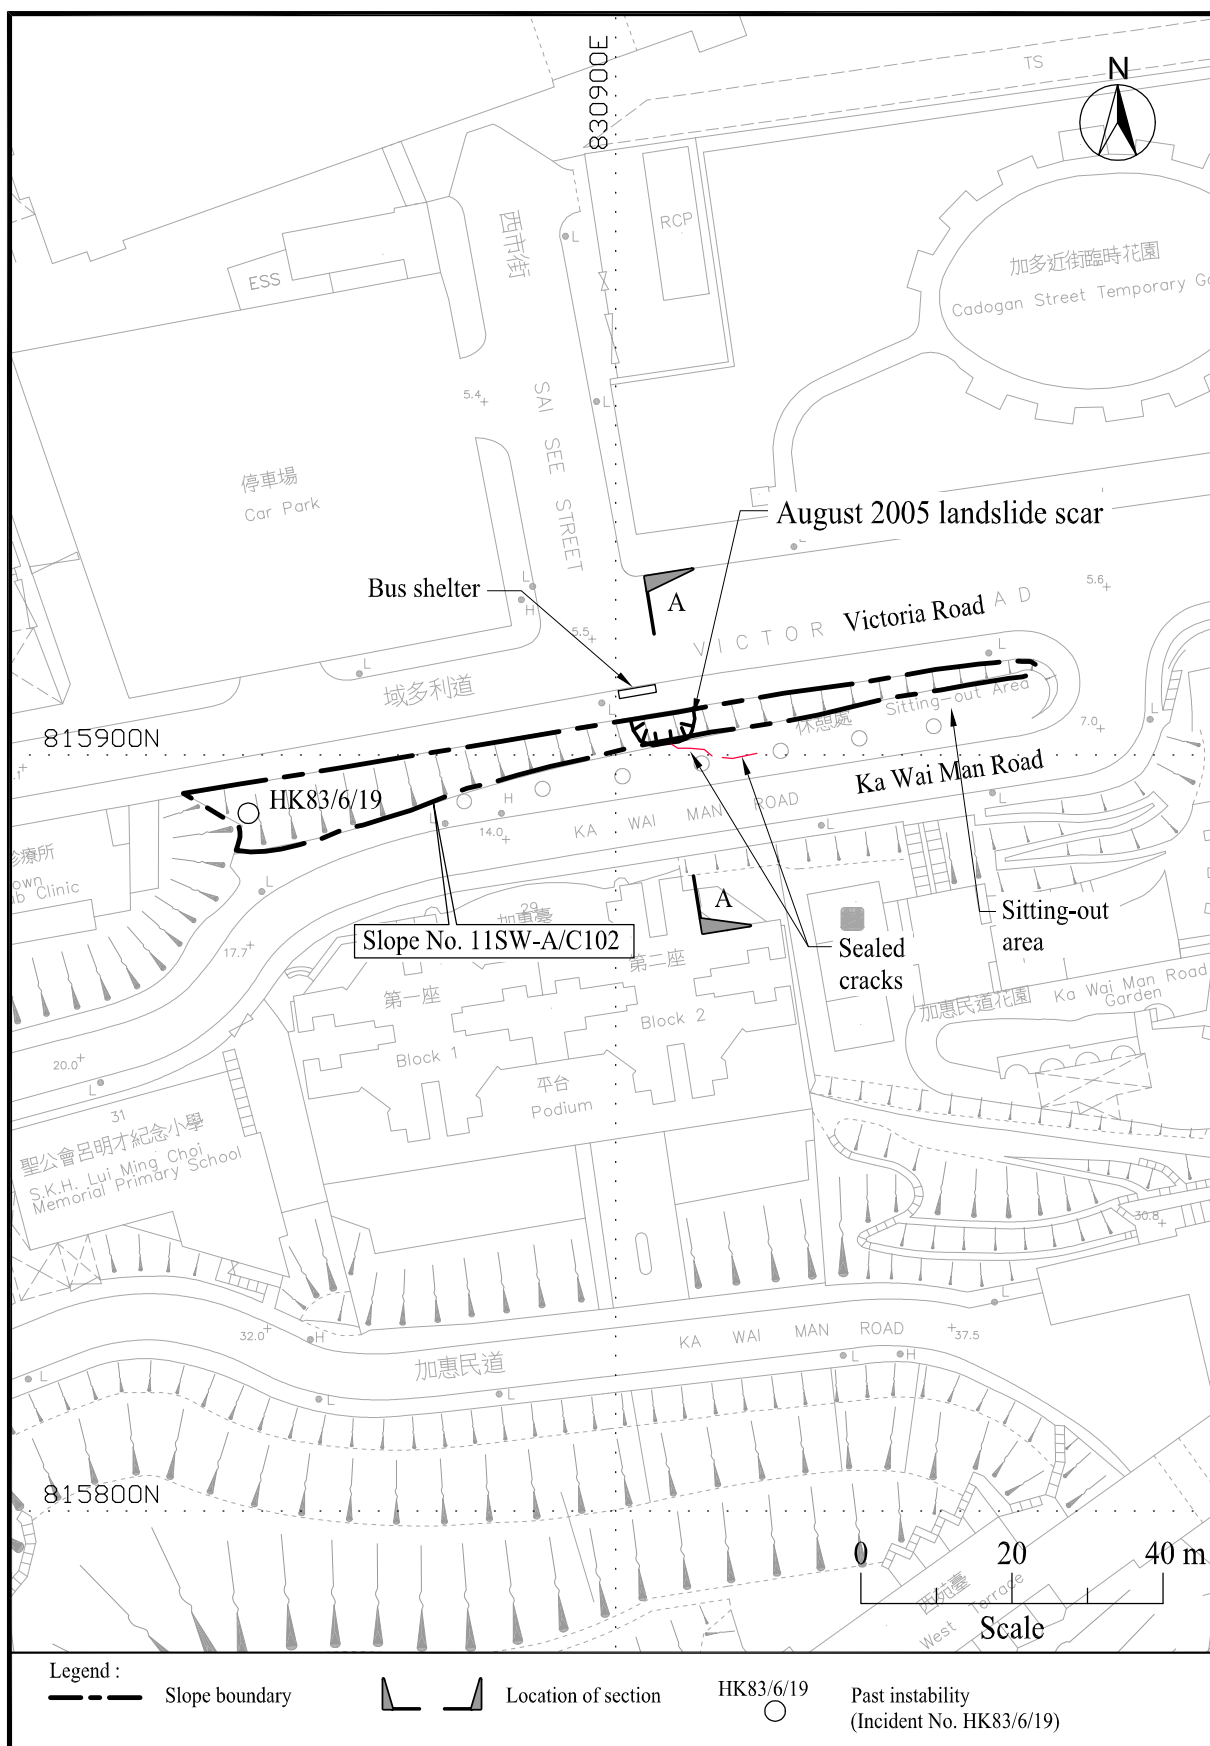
Site Location Plan (Slope No. 11SW-A/C102)
